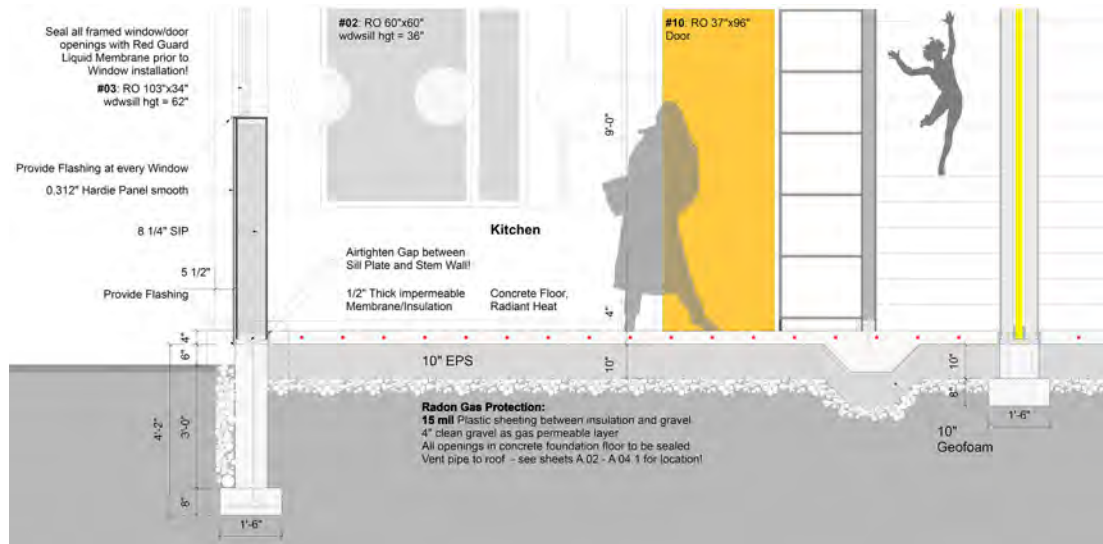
Thermal-bridge free floor slab to stem-wall detailing.
